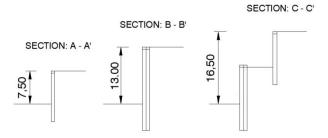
Typical cross-section, showing the highs of the contention in meters.
